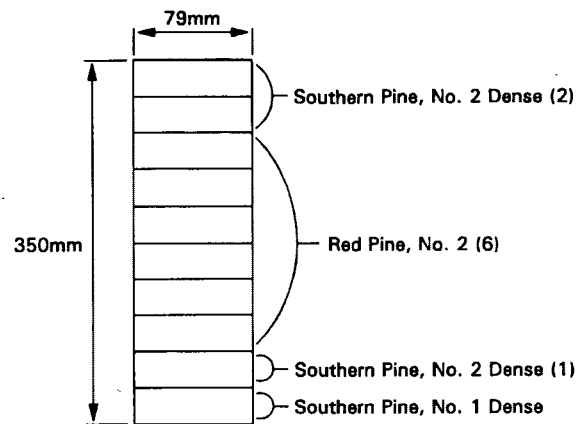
Southern pine-red pine beam laminations used for Teal River bridge.
